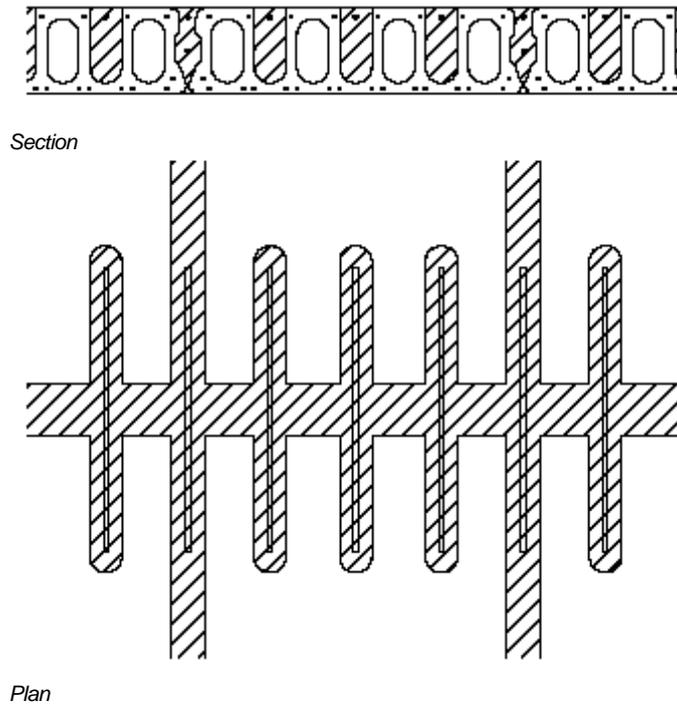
a Upper reinforcement in pre-stressed hollow core slabs
